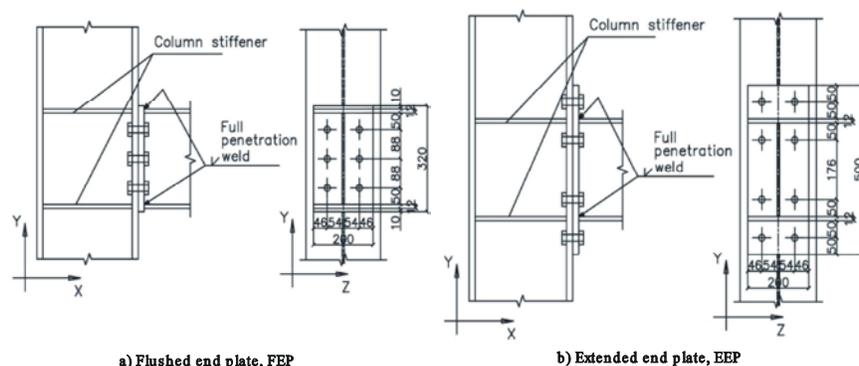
Details of FEP and EEP connections considered in this study (dimensions in mm).
